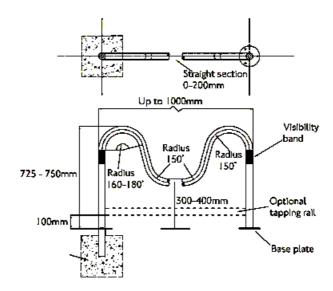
CaMden M Stand Plan and Elevation (TfL)
